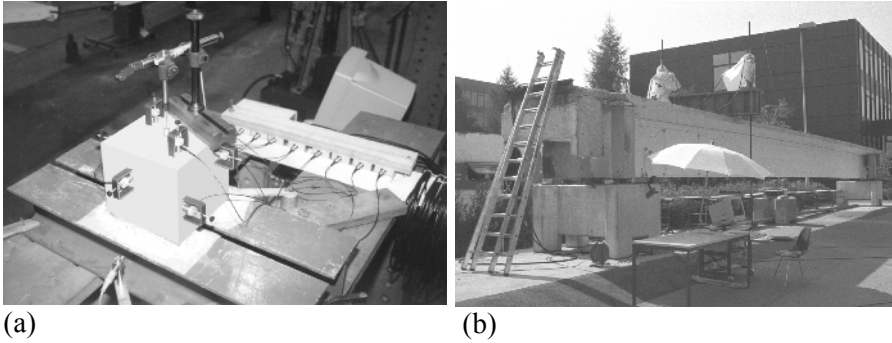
AE equipment used in laboratory conditions and for a full-scale failure test outside of the laboratory, from Köppel and Vogel [2000].
